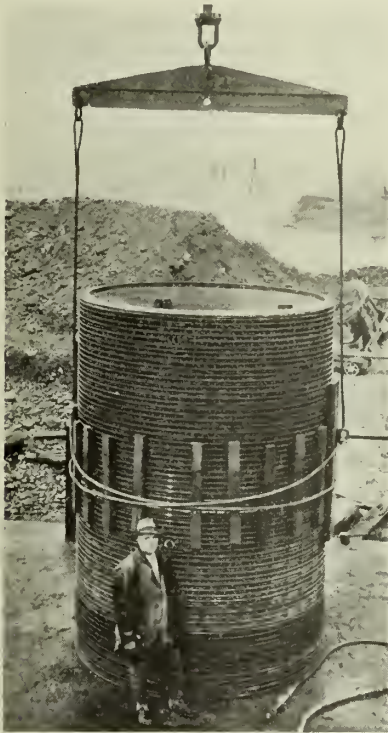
Section of Tunnel Pipe Ready for Lowering.
